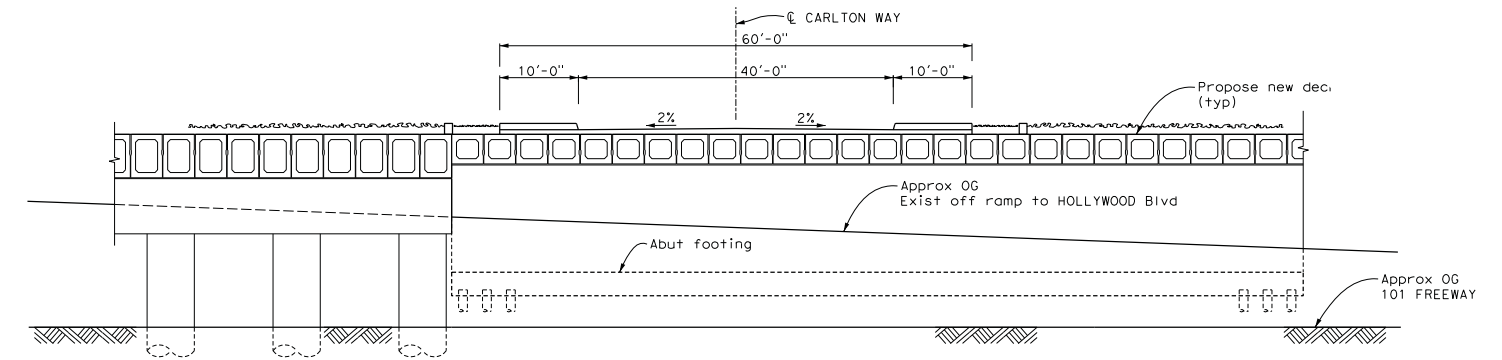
Typical Section F-F Showing New Carlton Way Overcrossing
